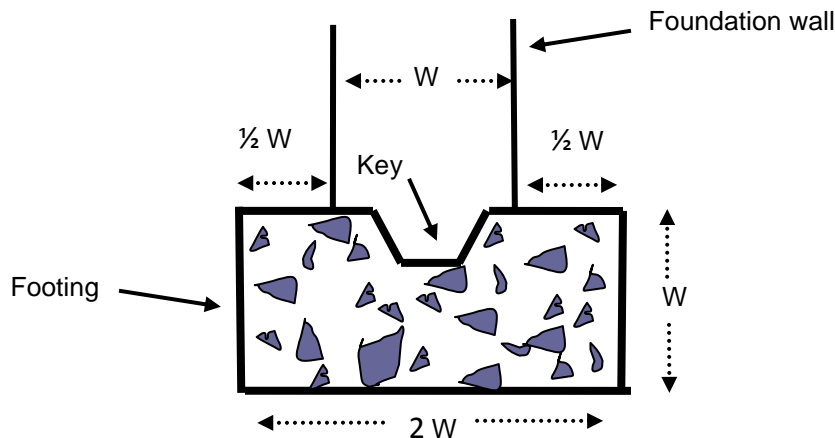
Standard Footing Design For Residential Construction. The footing is twice the width of the foundation.
